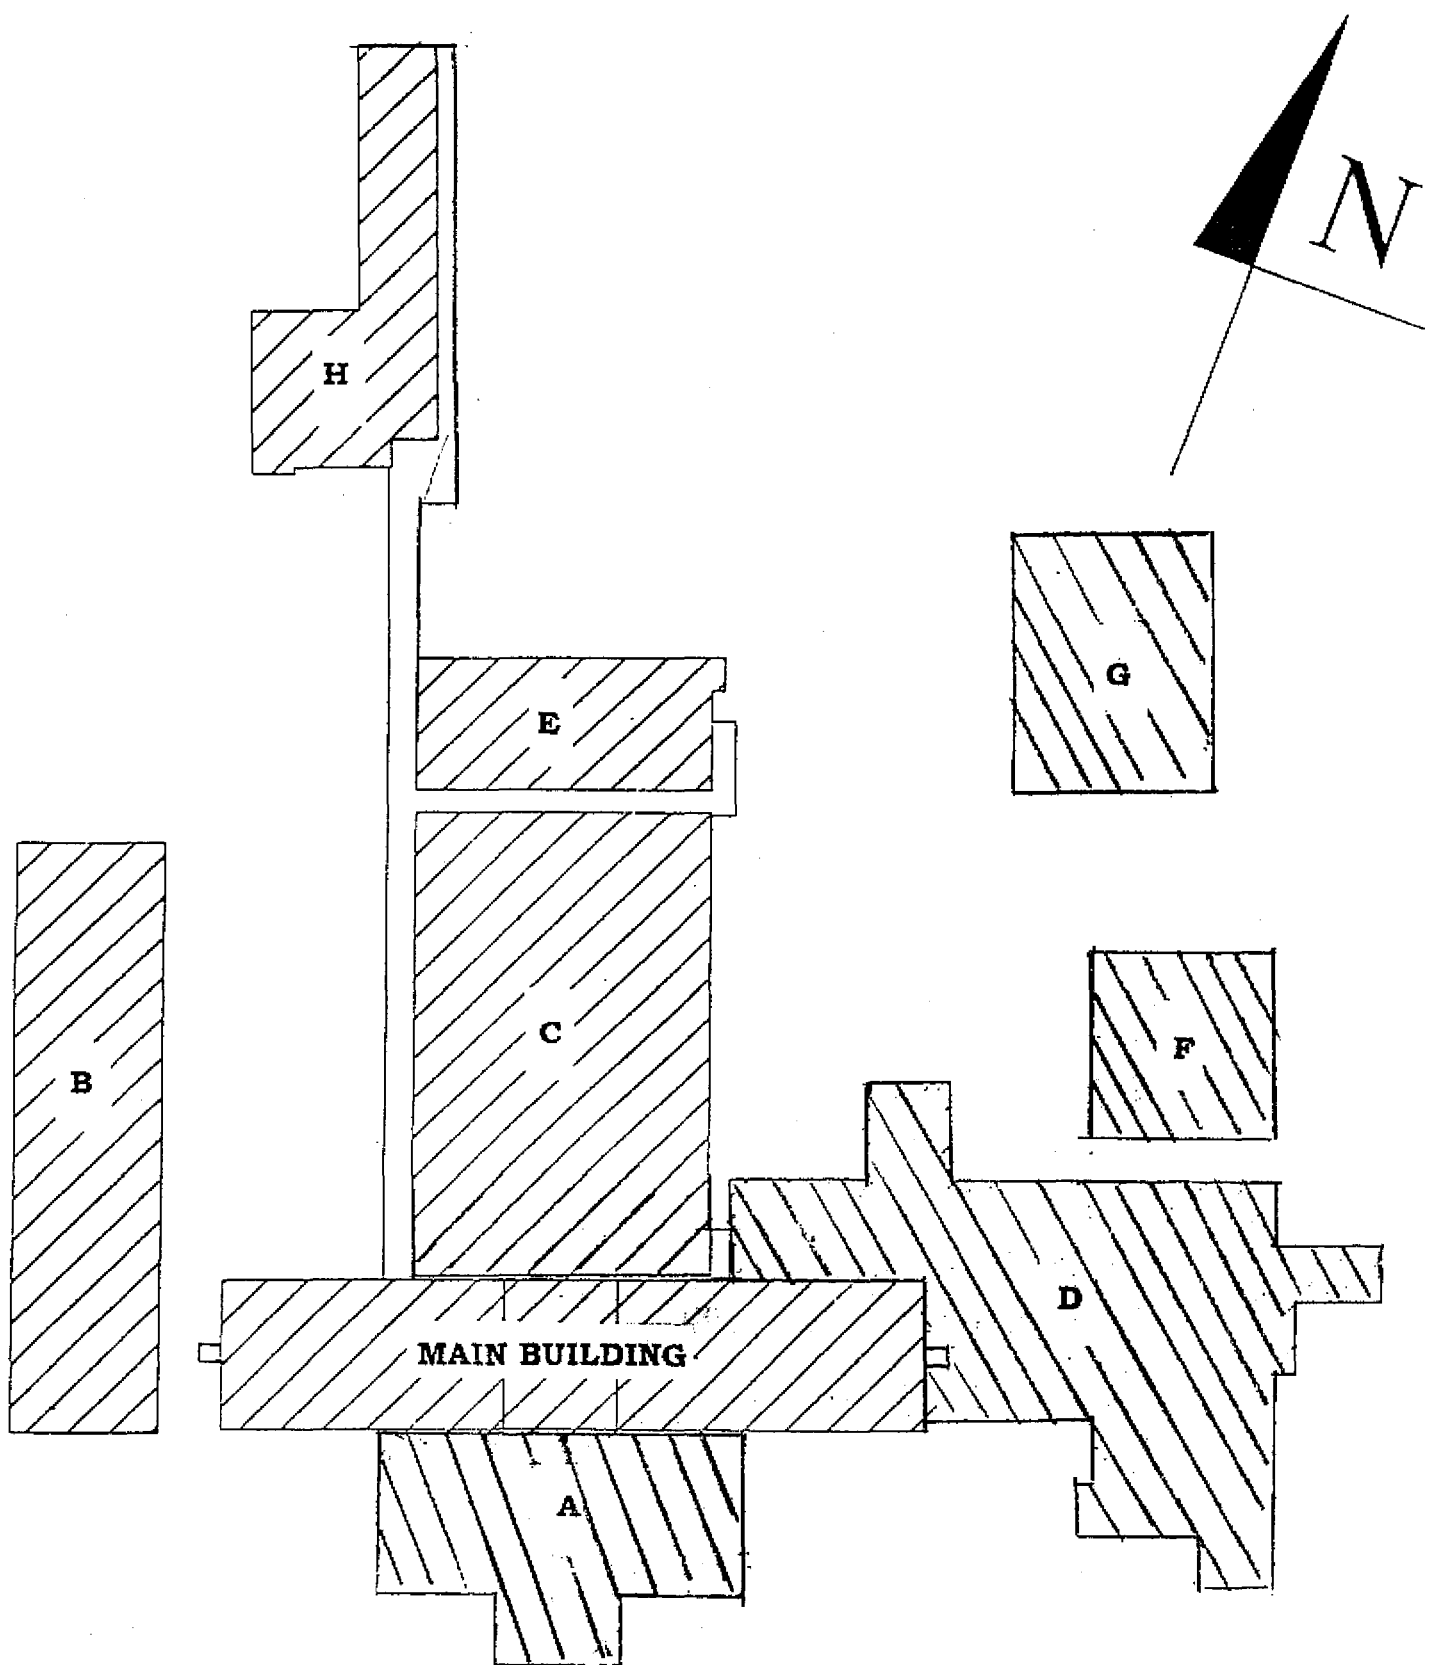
Layout of the Hospital Buildings (scaleless)
